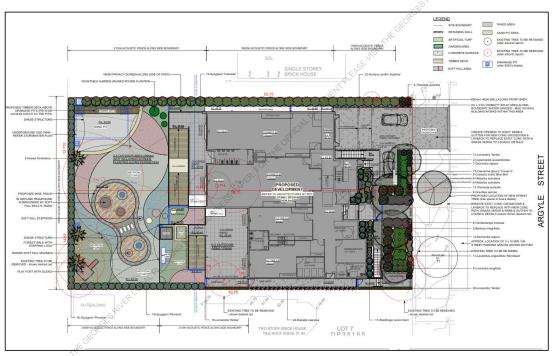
Landscape plan (Source: Contour Landscape Architecture)
